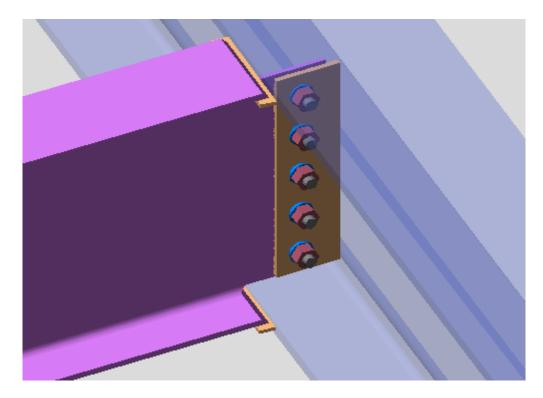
Real life beam to beam connection (T-Shape Stiffener)
